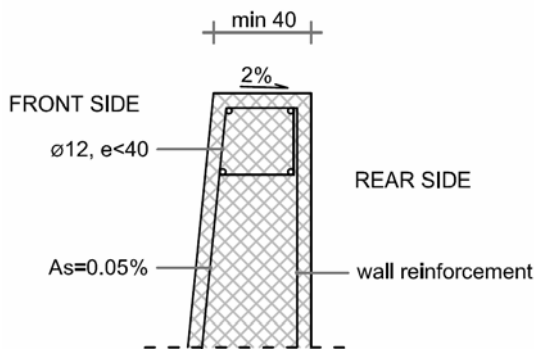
Detail of crown of reinforced concrete gravity retaining wall
